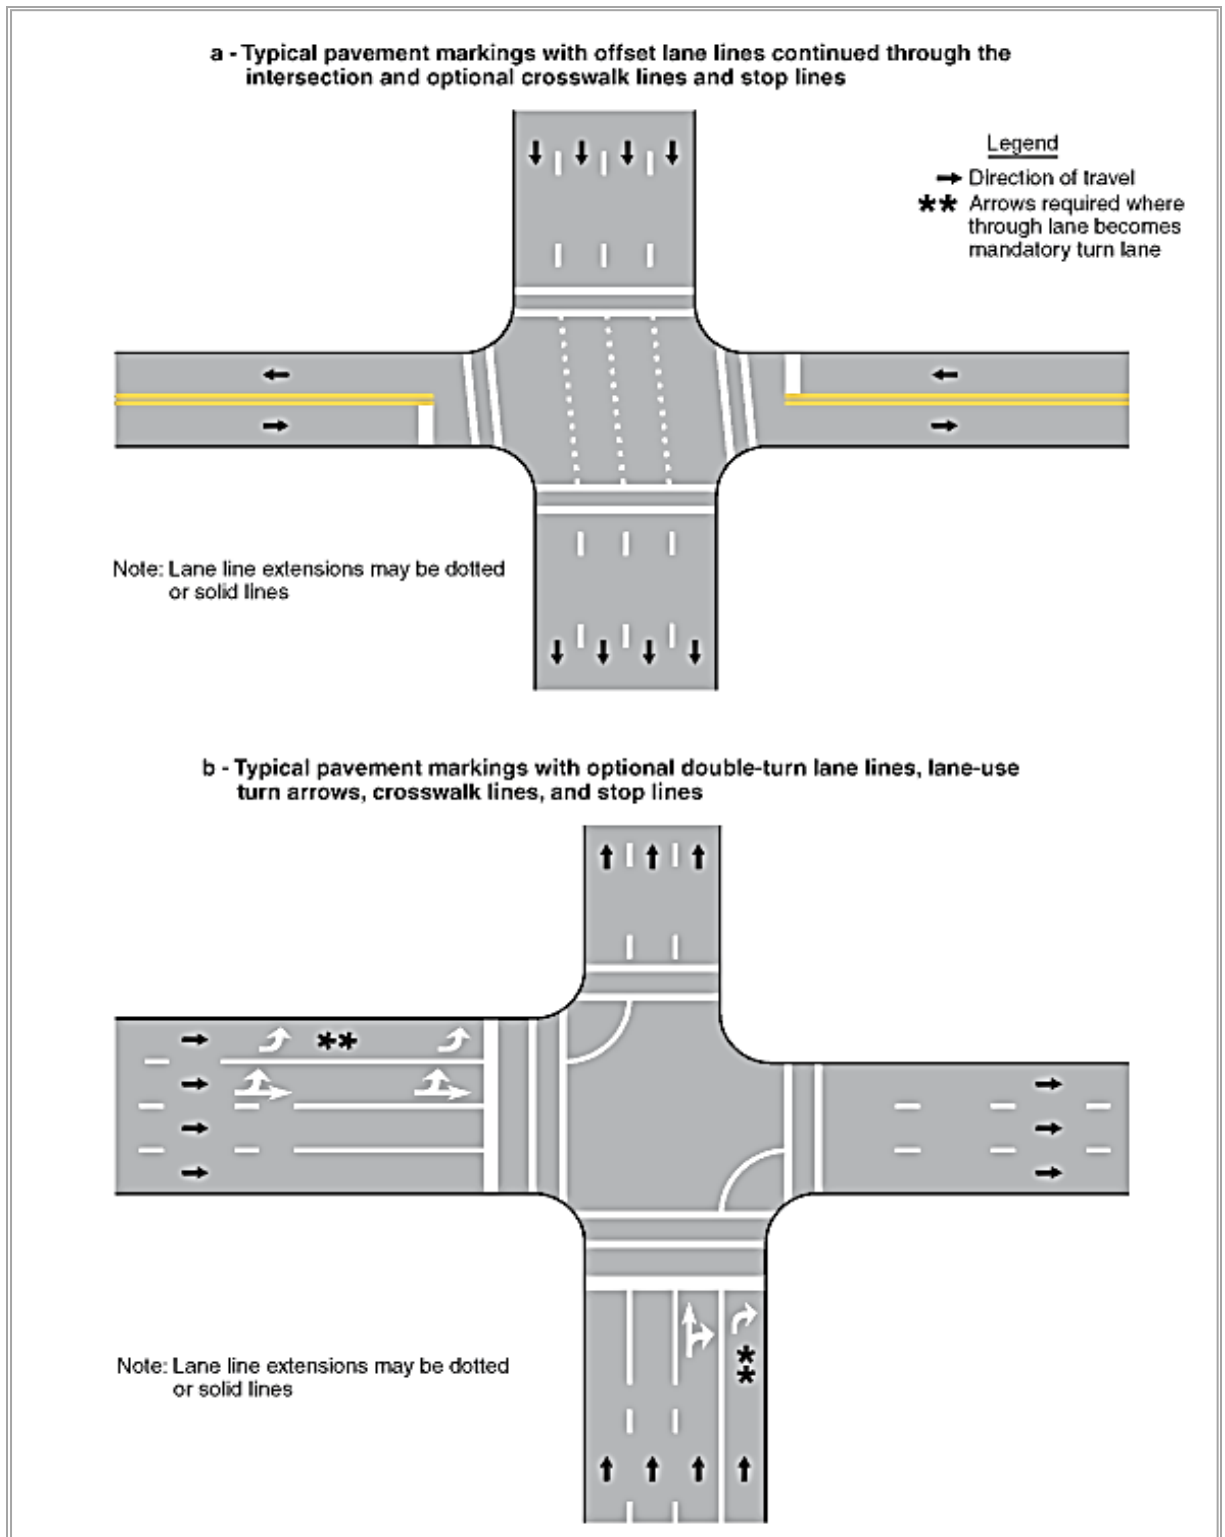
/7: Examples of Extensions through Intersections [2, p.3B-23]
